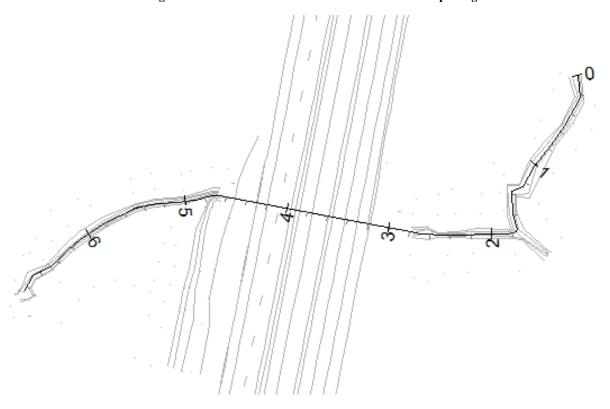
Longitudinal profile stationing for existing and proposed conditions
